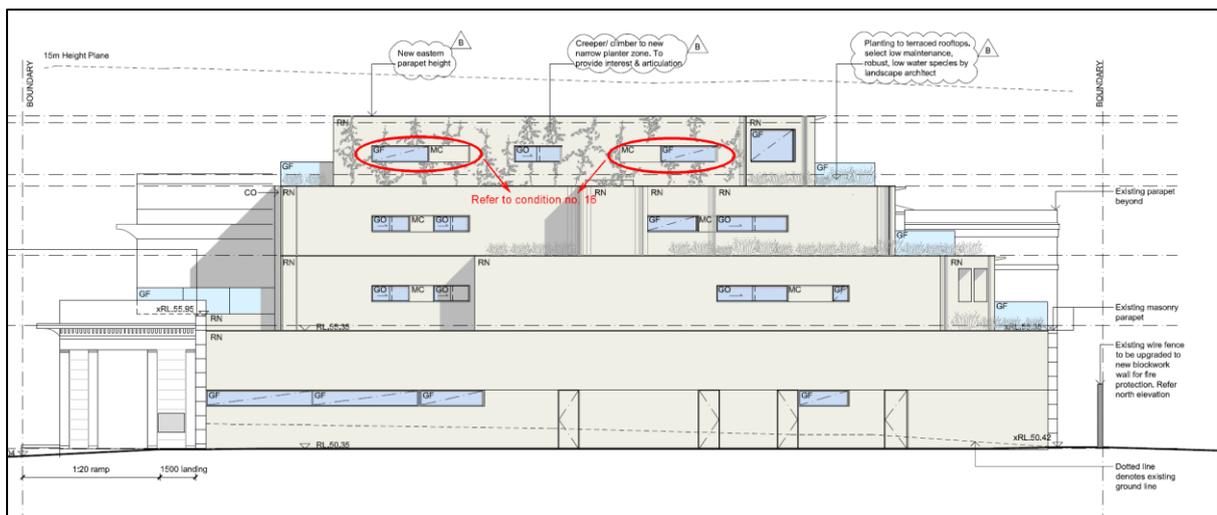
Excerpt of plans from the development approved under D/2014/1164 showing the approved eastern elevation.
